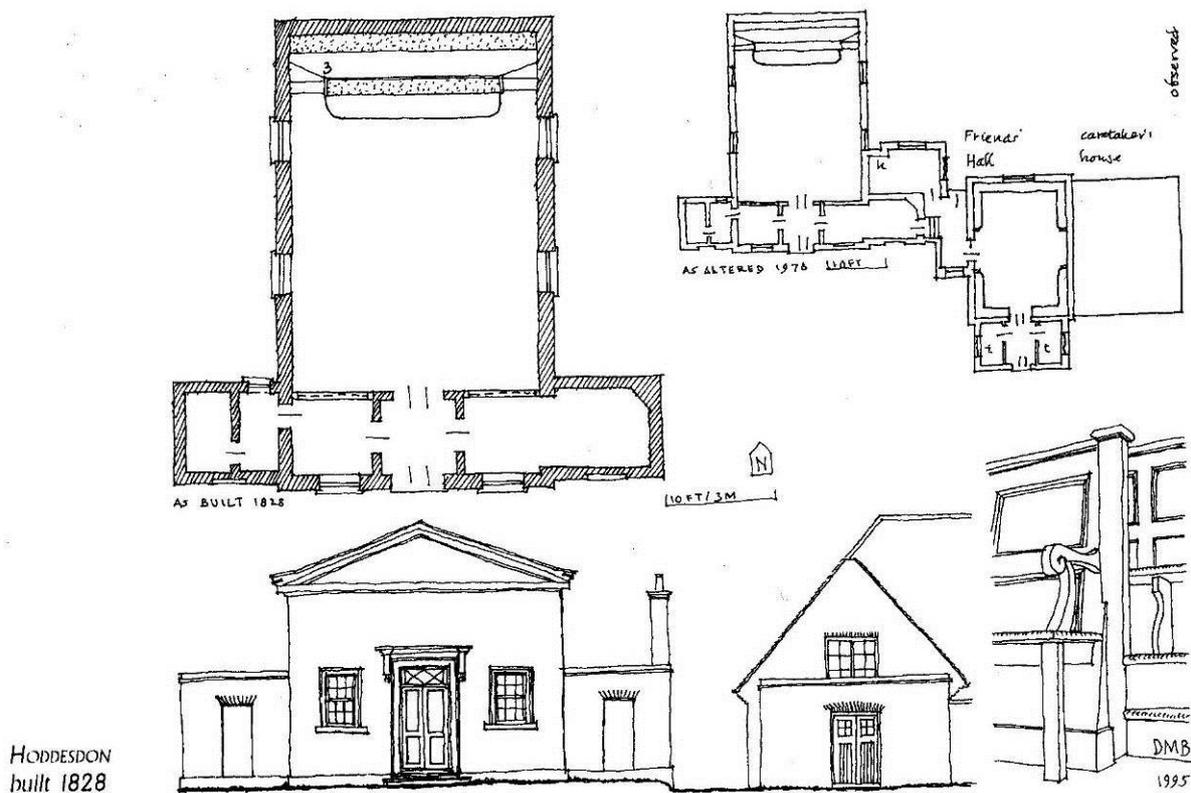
Original plan, existing plan, elevation and detail of elders' stand, from Butler, Vol. 1, p. 261
